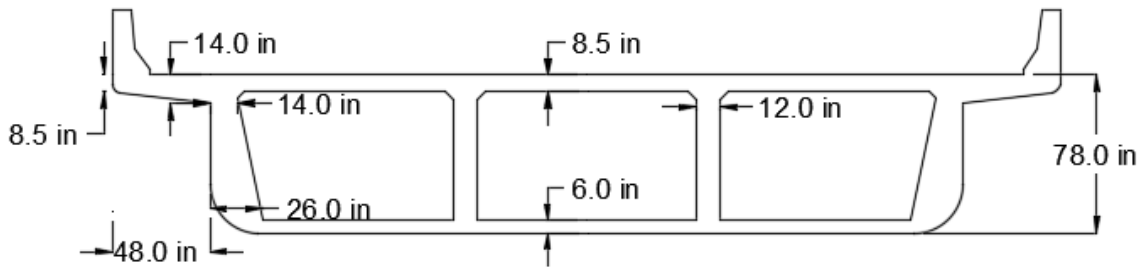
Cross-section view of the Airport Connector box girder bridge
